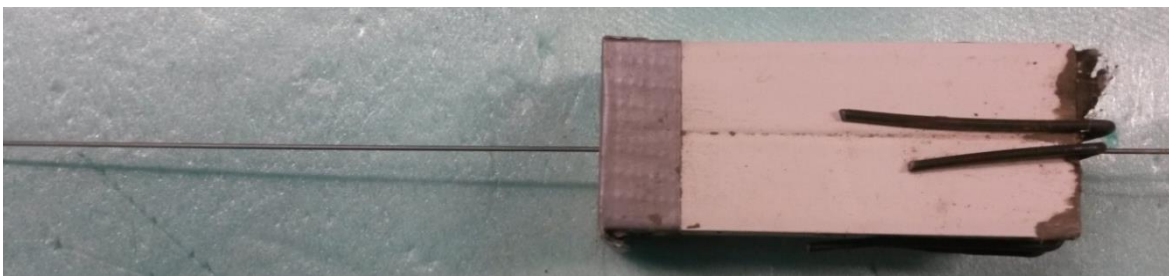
60 mm pull-out specimen containing 1 wire.
